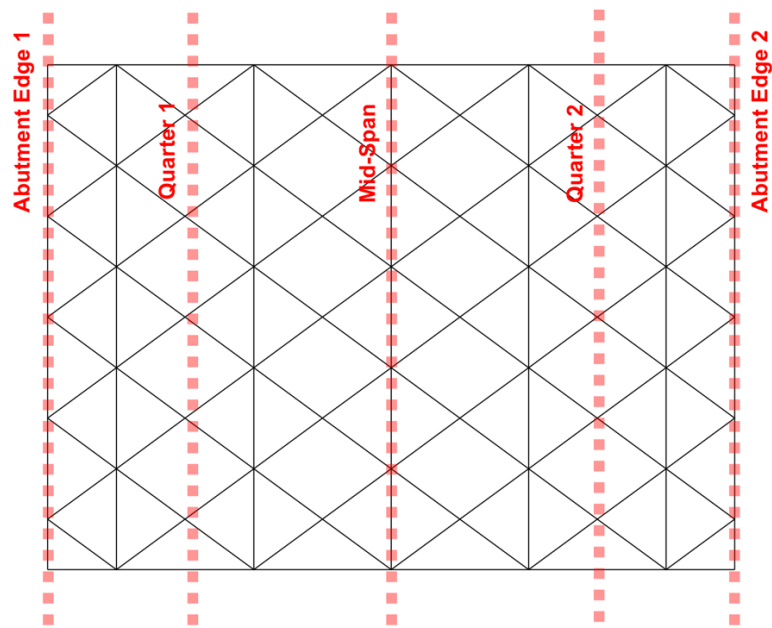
Shell 1 Key Plan (not to scale) rotated to correspond to schematic section below
